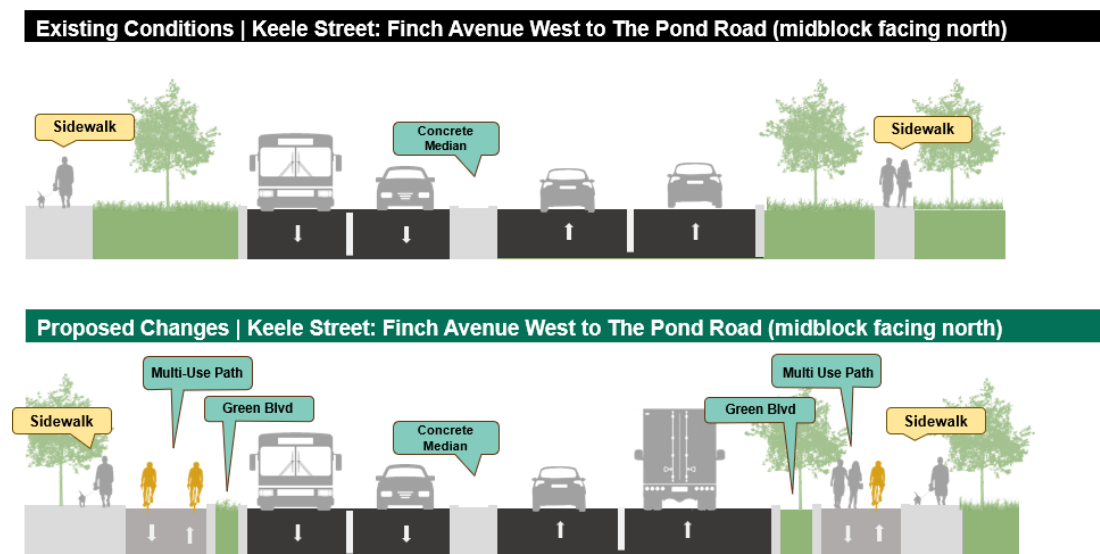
Existing and Recommended Design for Finch Avenue West to The Pond Road
